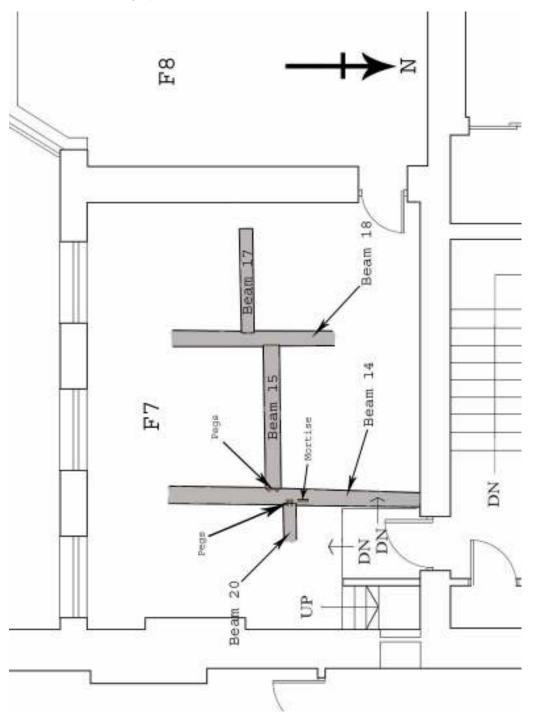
Plan of timbers in room F7 (timbers 14-20).
